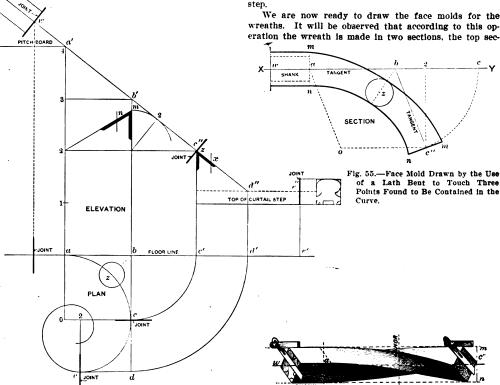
Plan and Elevation of Scroll Hand Rail Covering Two
